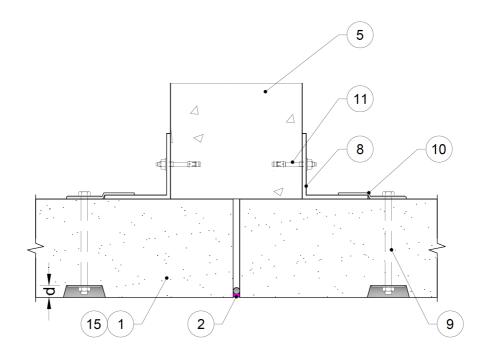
Plan Section at Vertical Concrete Column – Z Clips and Recessed Bolts
